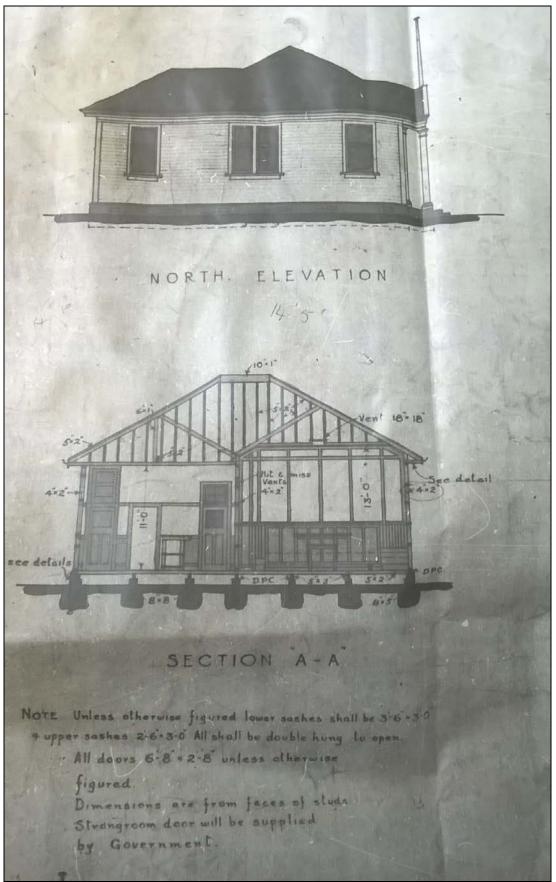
North elevation of Papakura Courthouse and cross section. Mair, J. T., Papakura Courthouse (copy), Public Works Department Collection. Copy on Auckland Council property file for Central Park.
